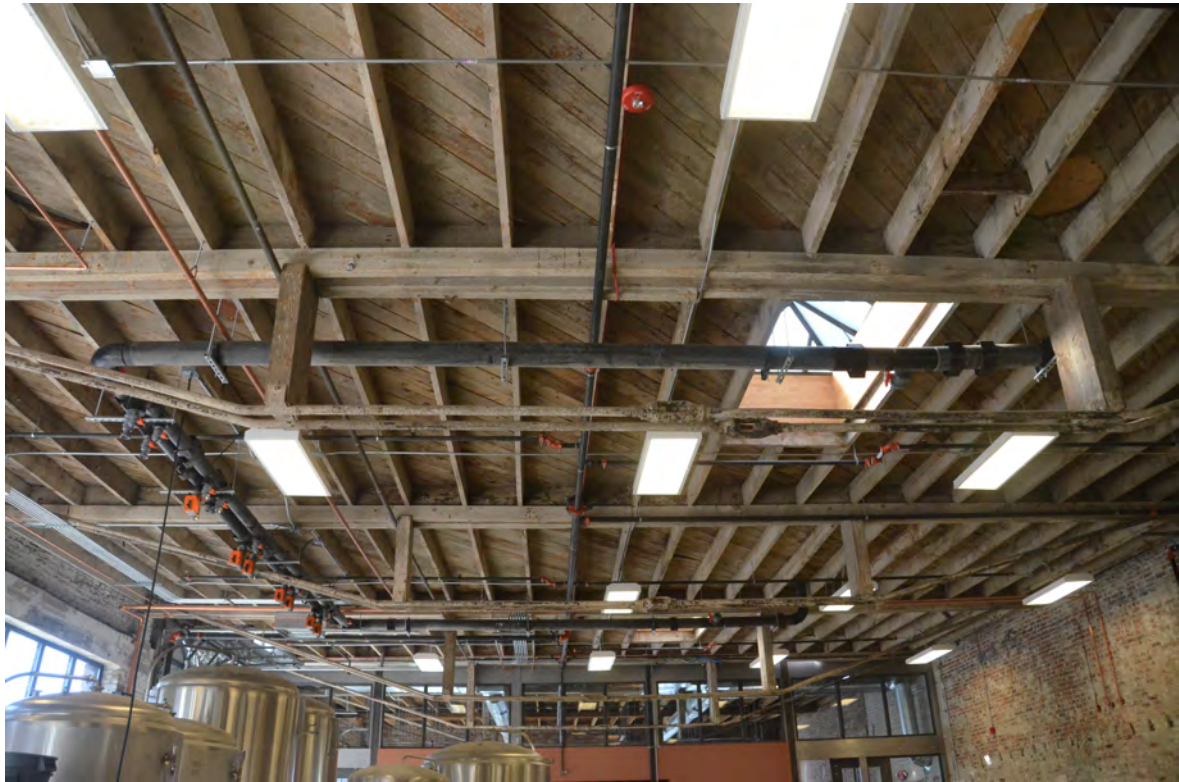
Looking South at Ceiling Trusses, Rafters, and Roof Decking
